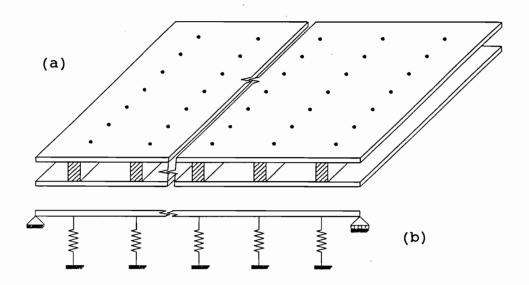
Wall System with Framing Members as Elastic Springs and Sheathing as a Distributor Beam, (a) Real System, (b) Mechanical Analog for Beam on Elastic Foundation
